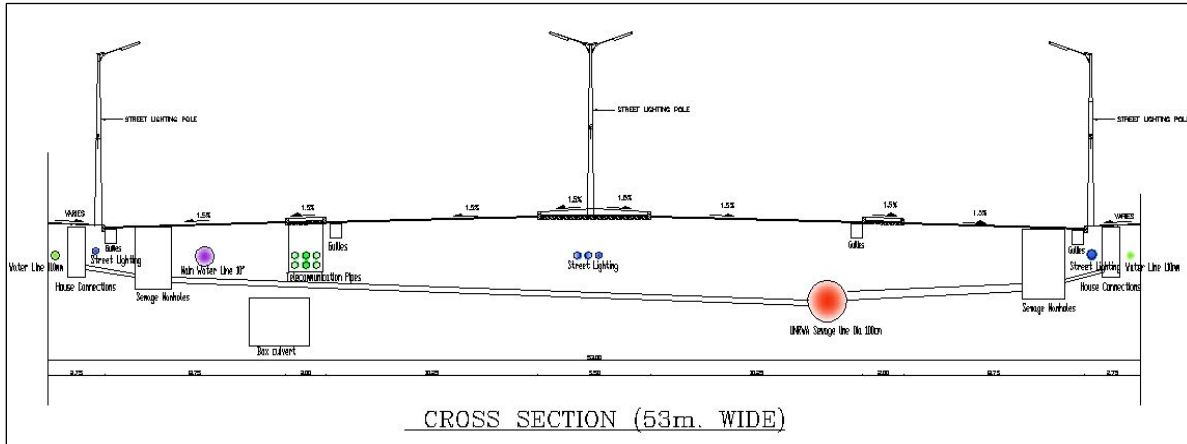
Cross section of Salaheldein Road including the existing Infrastructure
